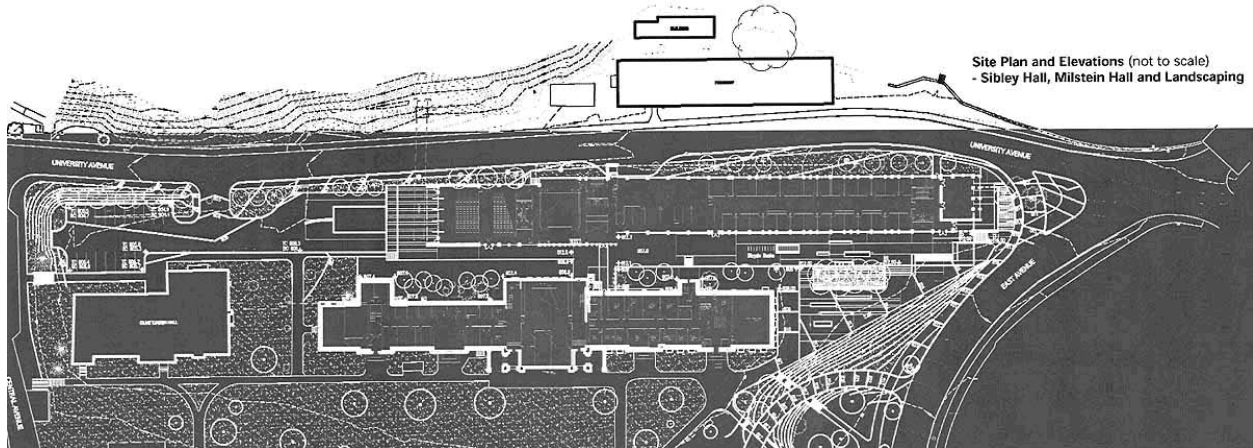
Site plan, Barkow Leibinger proposal.
